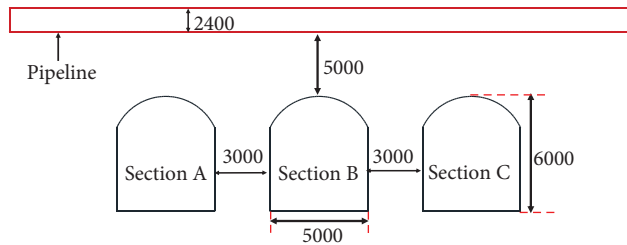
Sectional drawing of underground excavation (units: mm).
